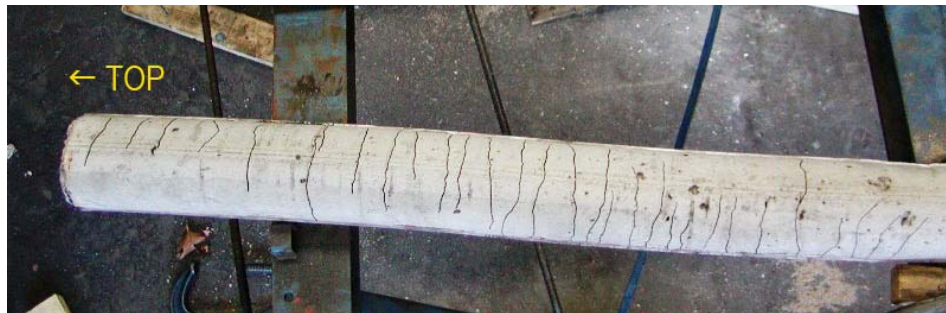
Core Concrete of Column B2-C5 after Test 10
